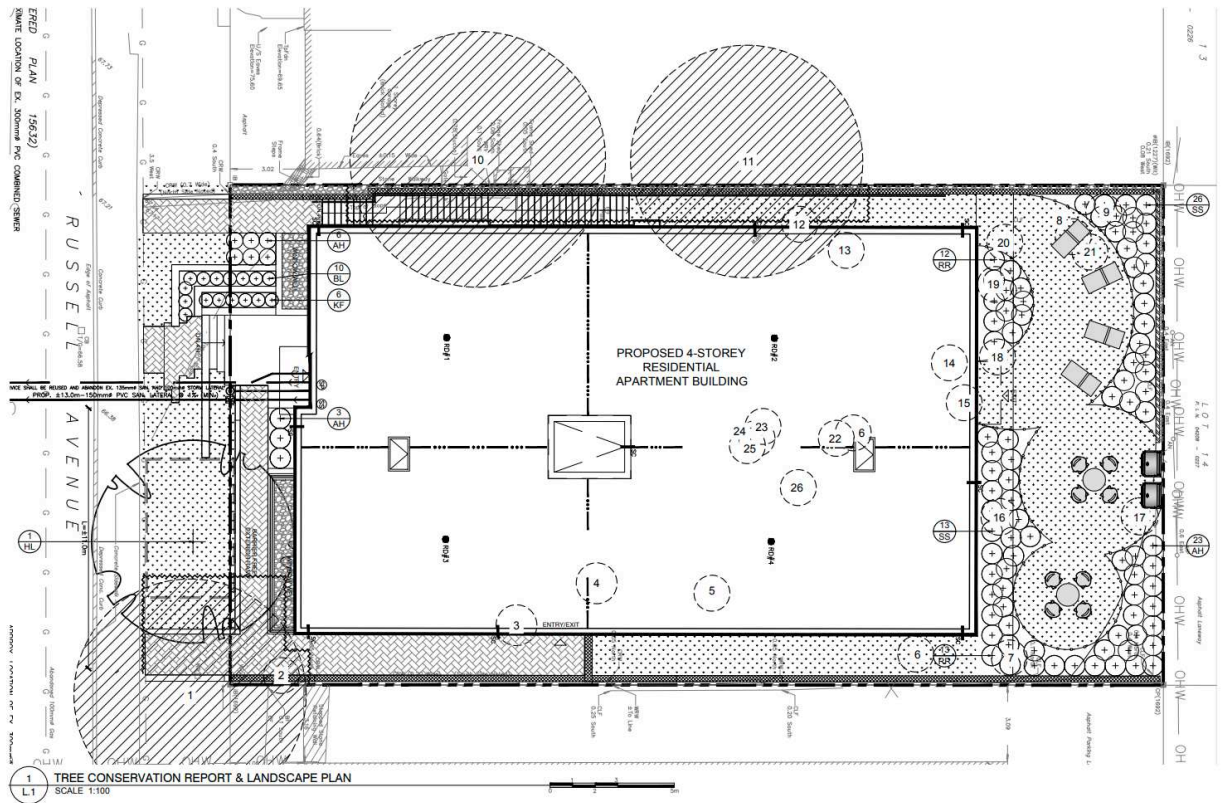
Except from Landscape Plan (Source: Lawrence Architects)
